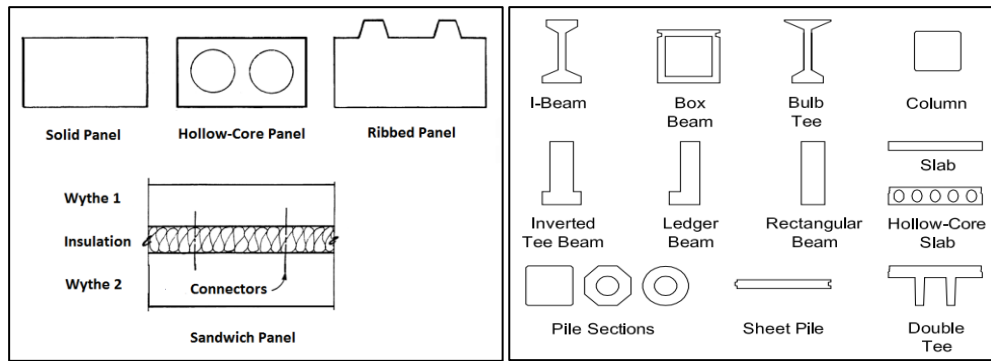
Cross Section of Commonly Used Precast Elements (PCI Design Handbook, 2004; Guide for Precast Concrete Wall Panels, 1993)
